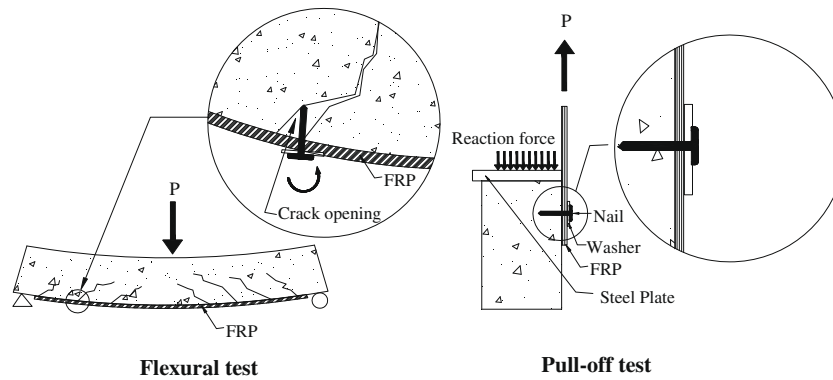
Illustration of fastener loading conditions and nail movements in beams and blocks.
